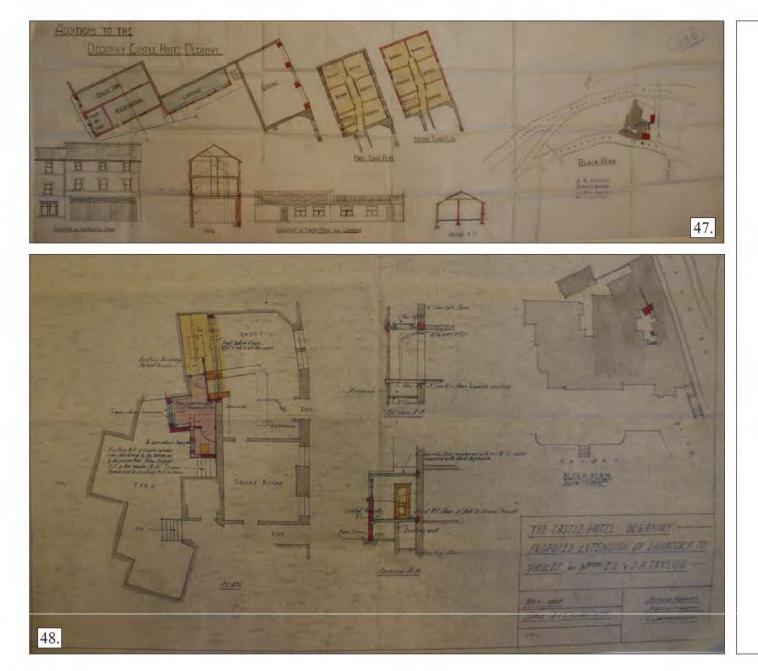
Architects Plans for Additions to the Deganwy Castle Hotel 1935. Source: Conwy Archives C Maps & Plans 23/2/339
